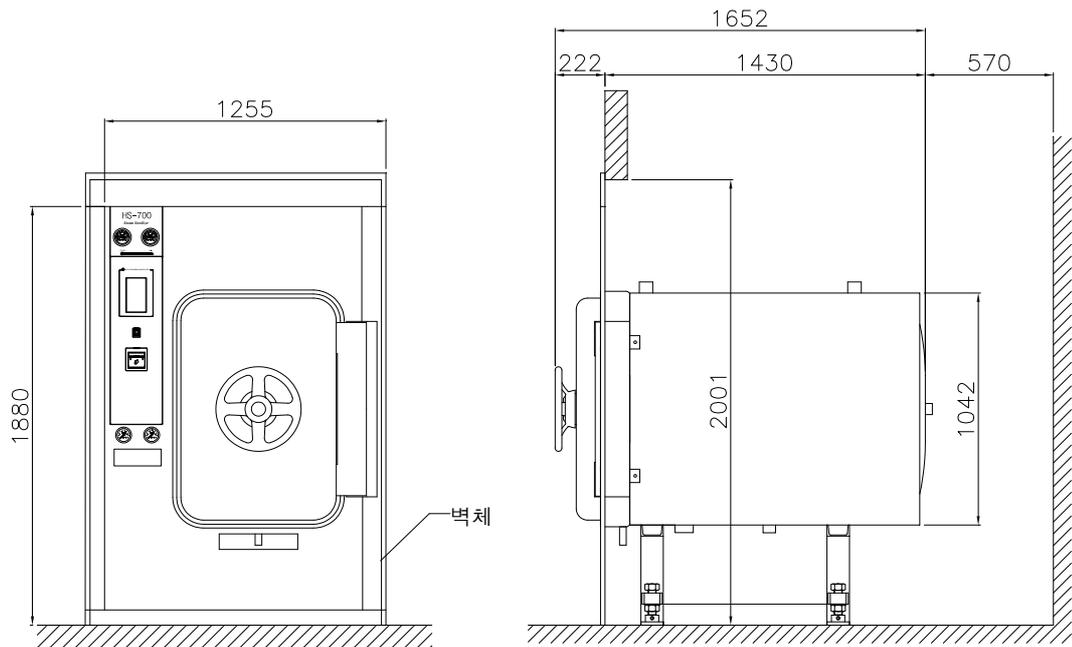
DETAIL STEAM STERILIZER CROSS SECTION (PLAN VIEW)
